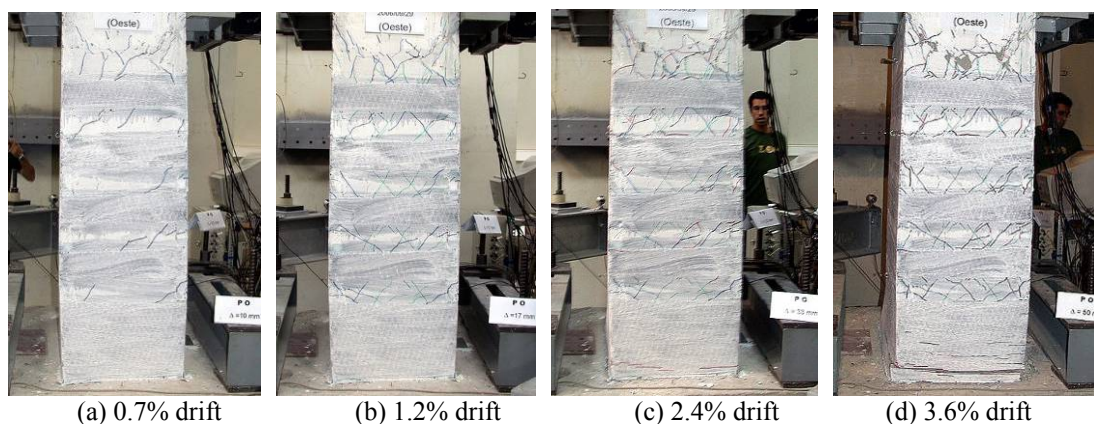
Retrofitted pier PO2-N2. Damage from west side view during the test.
